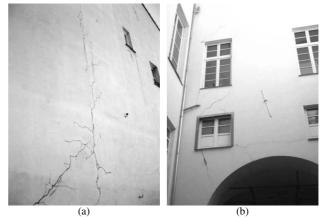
Some examples of the cracks' propagation on Gavotti Palace: along the masonry wall which borders the erecting yard (a), over one of the inner court's façades (b).
